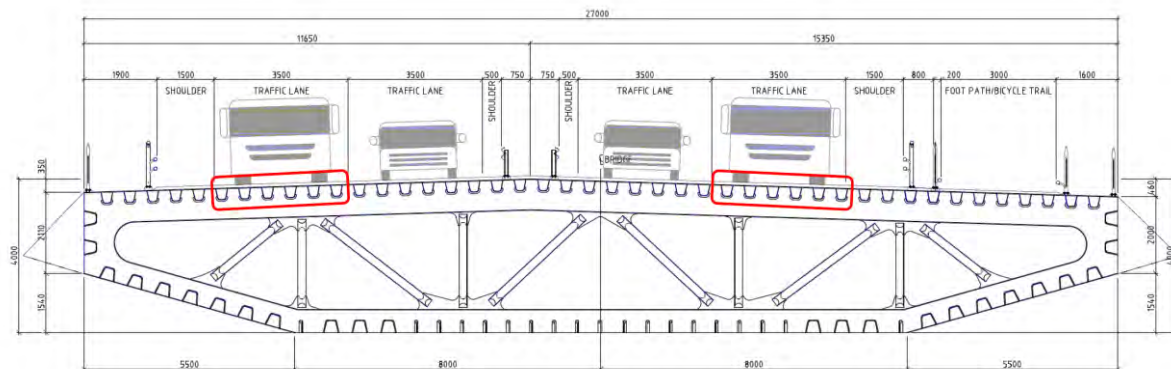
Areas in the bridge girder where local traffic loads are significant are below the slow traffic lanes
